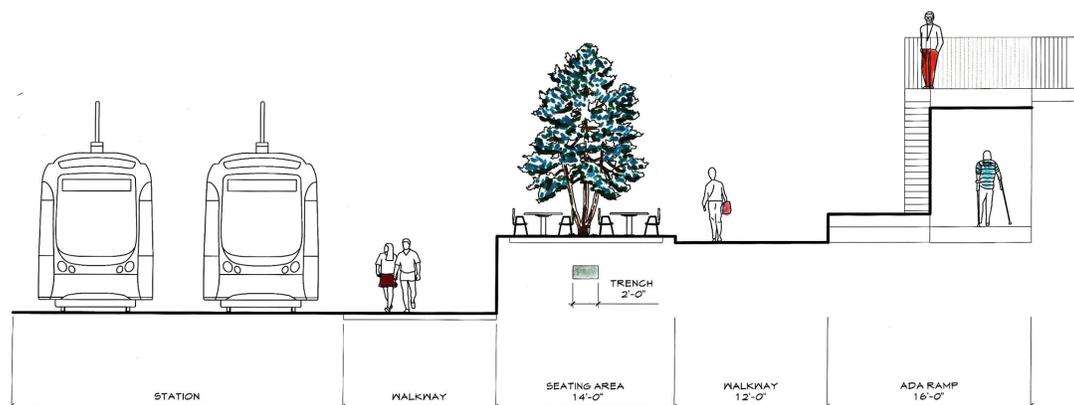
Section C of the north end of the station looking west. Pictured is the light rail platform, retaining wall, elevated seating area, and entrance to the pedestrian bridge via ramp and stairway.
